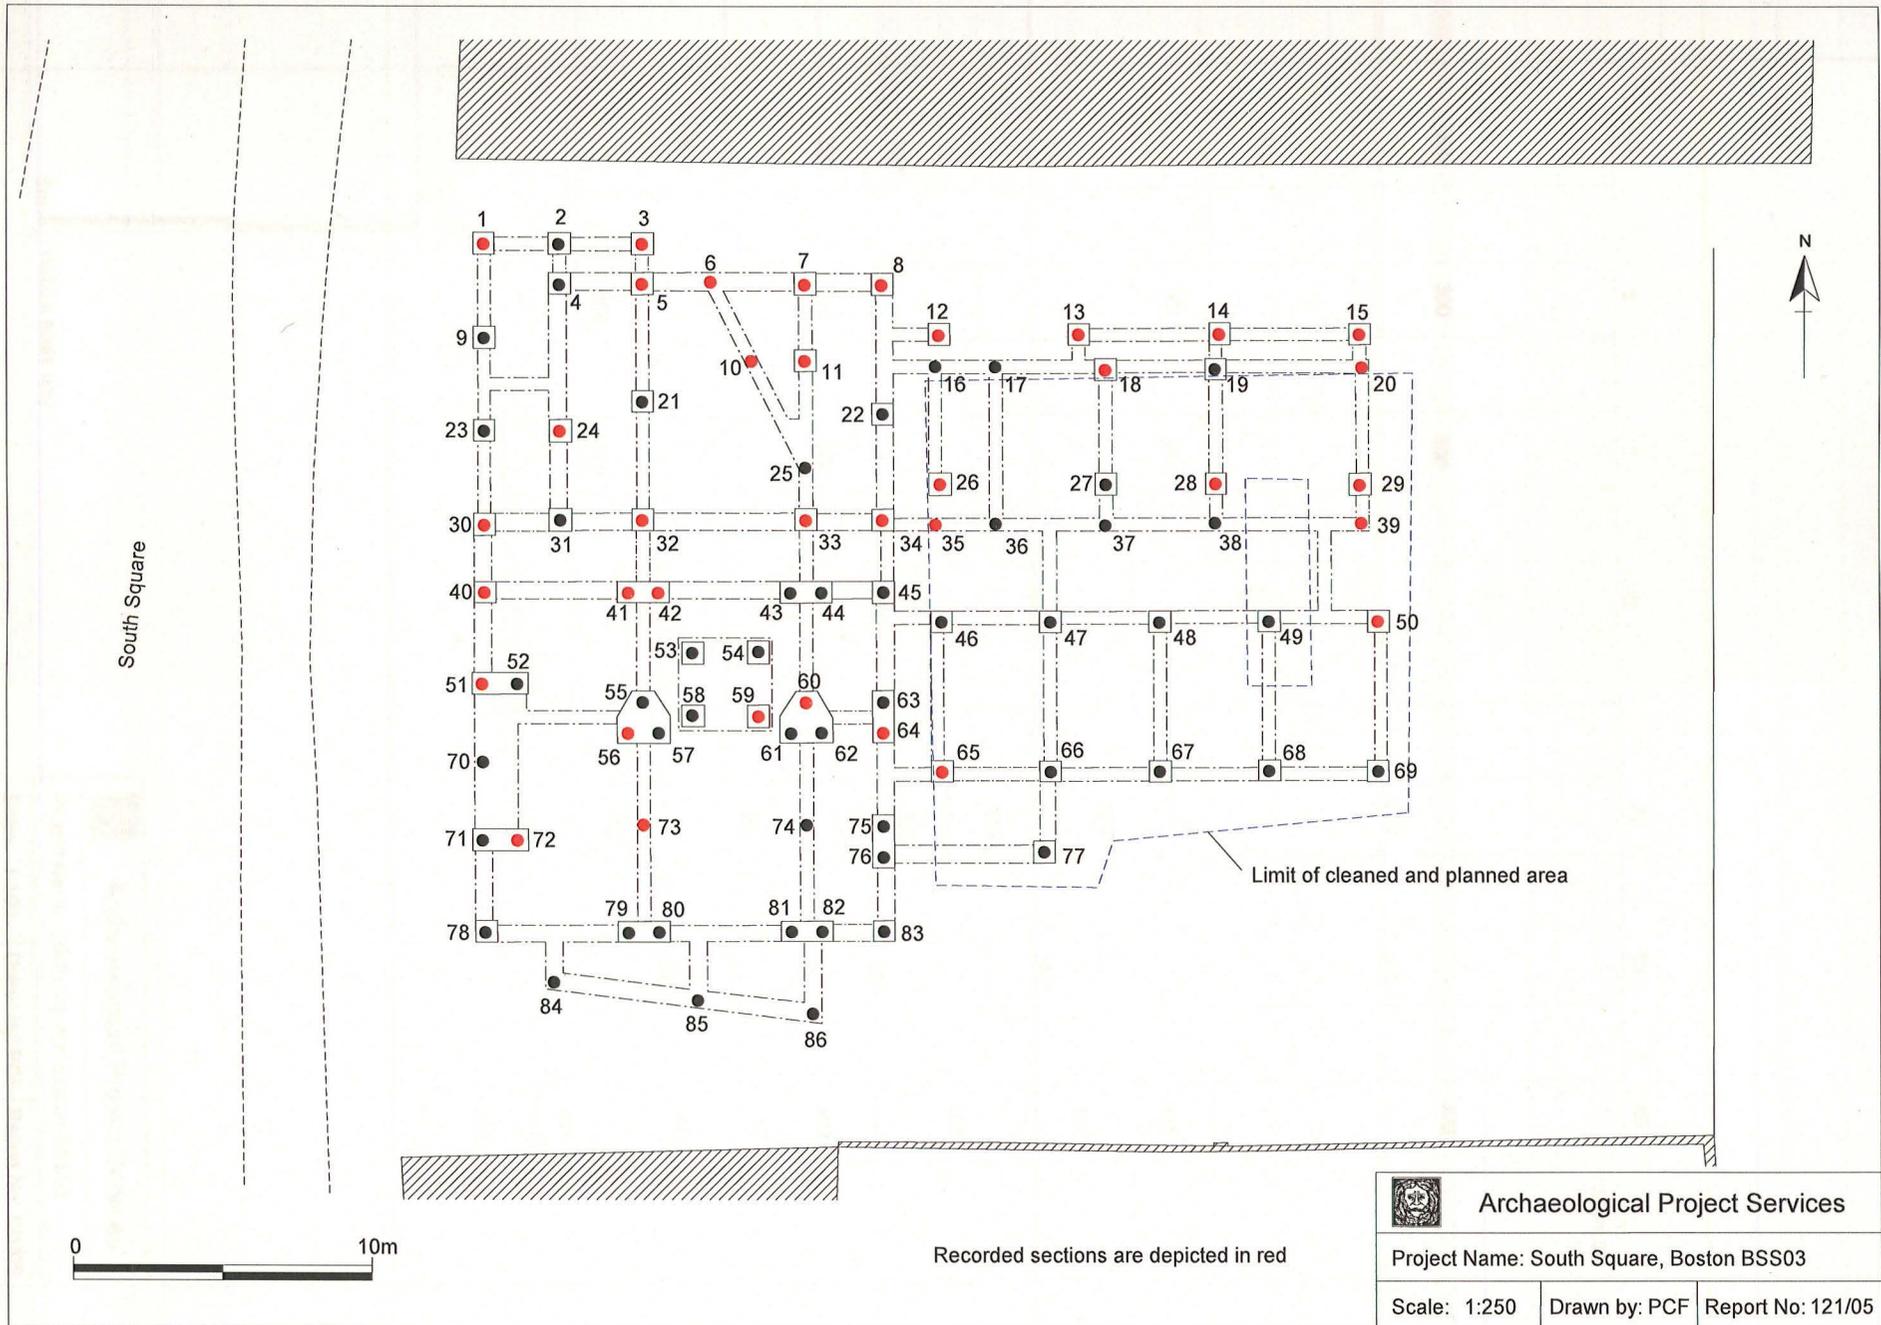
Plan of the piling arrangement showing recorded pile locations
